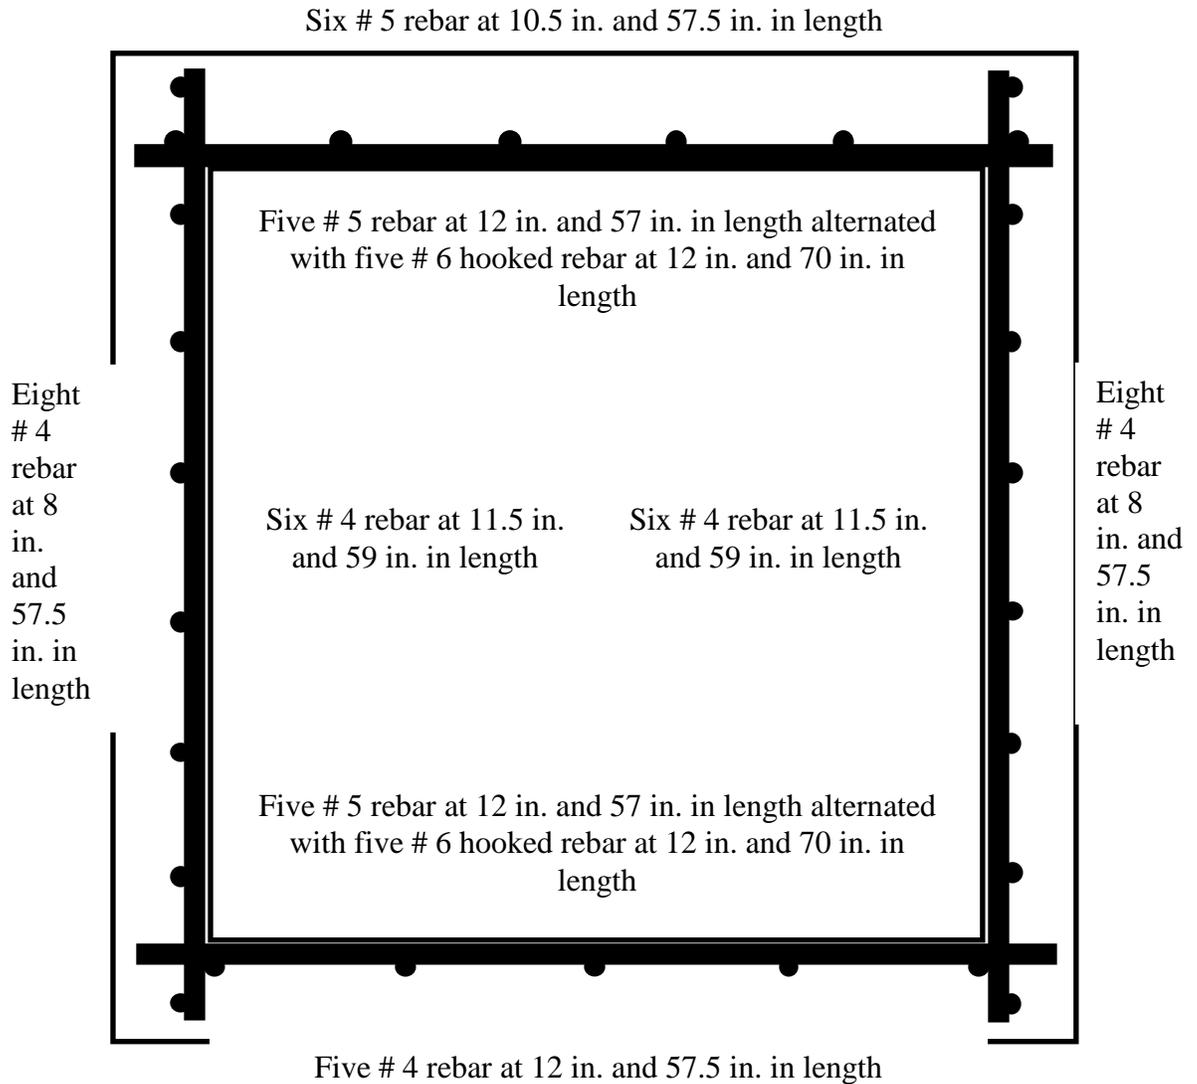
Culvert Cross-Section Including Rebar Placement
